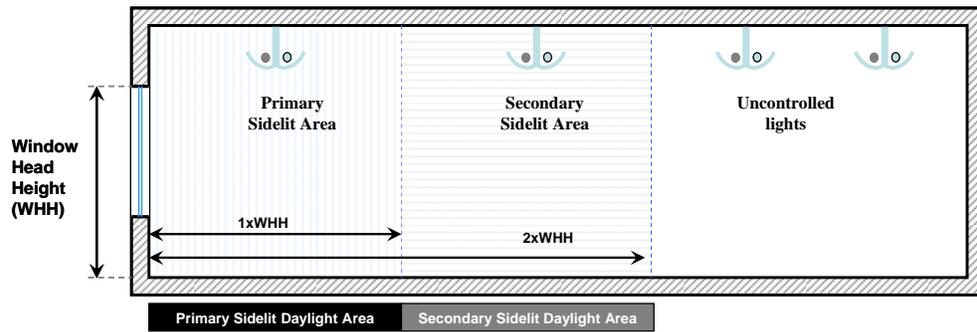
Section view: Primary and secondary sidelit daylight area
